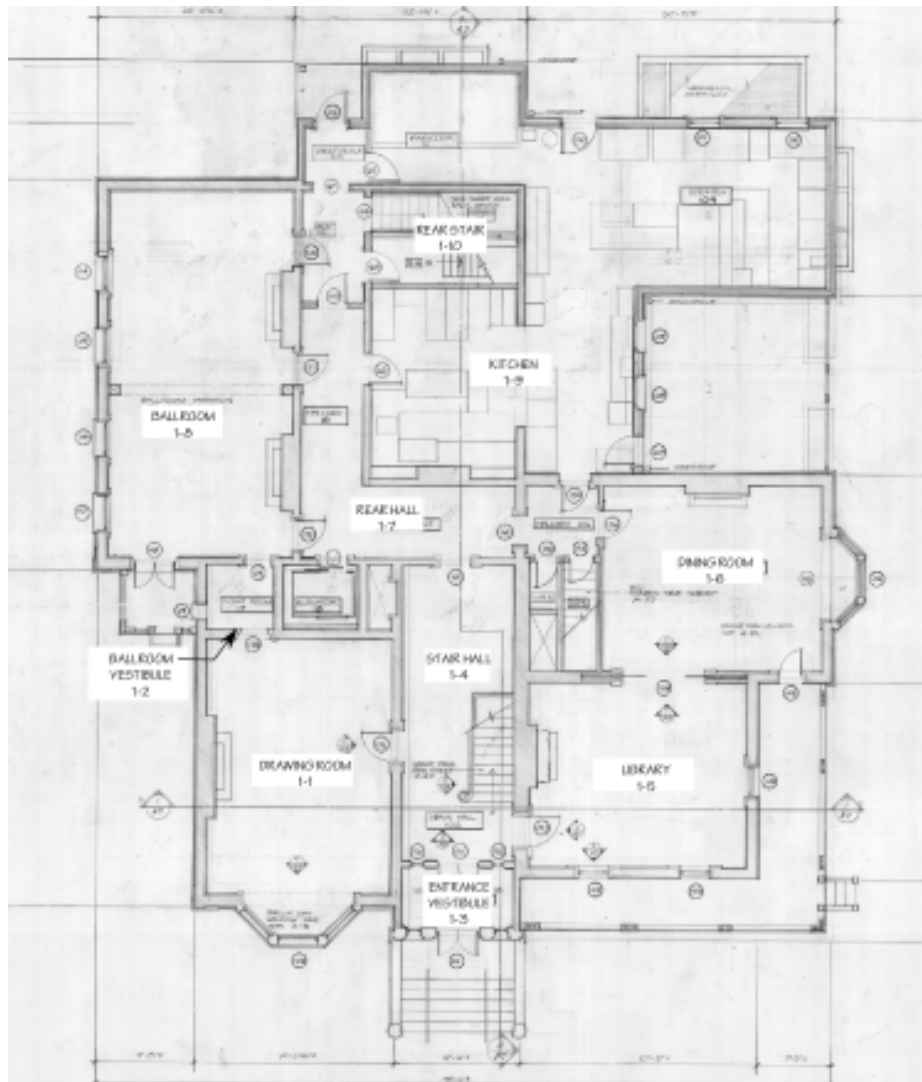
The first floor plan of the Devereux House prepared for the 1980s restoration, Burtch Beall collection, University of Utah archives, with superimposed annotations.
